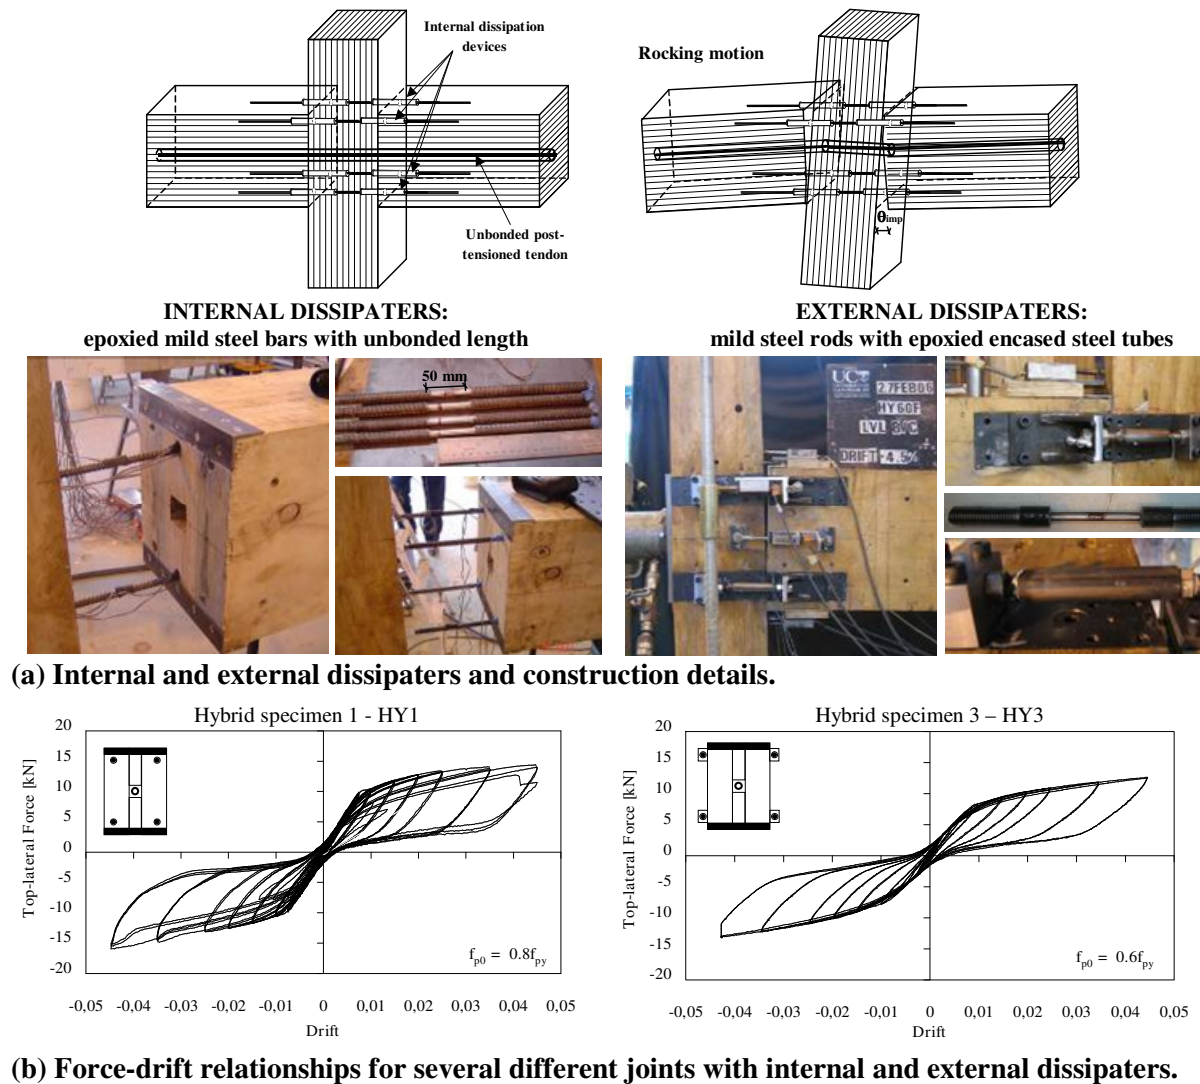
Arrangements and testing results of Pres-Lam beam-column joints with internal or external reinforcement (Palermo et al., 2005, 2006)
